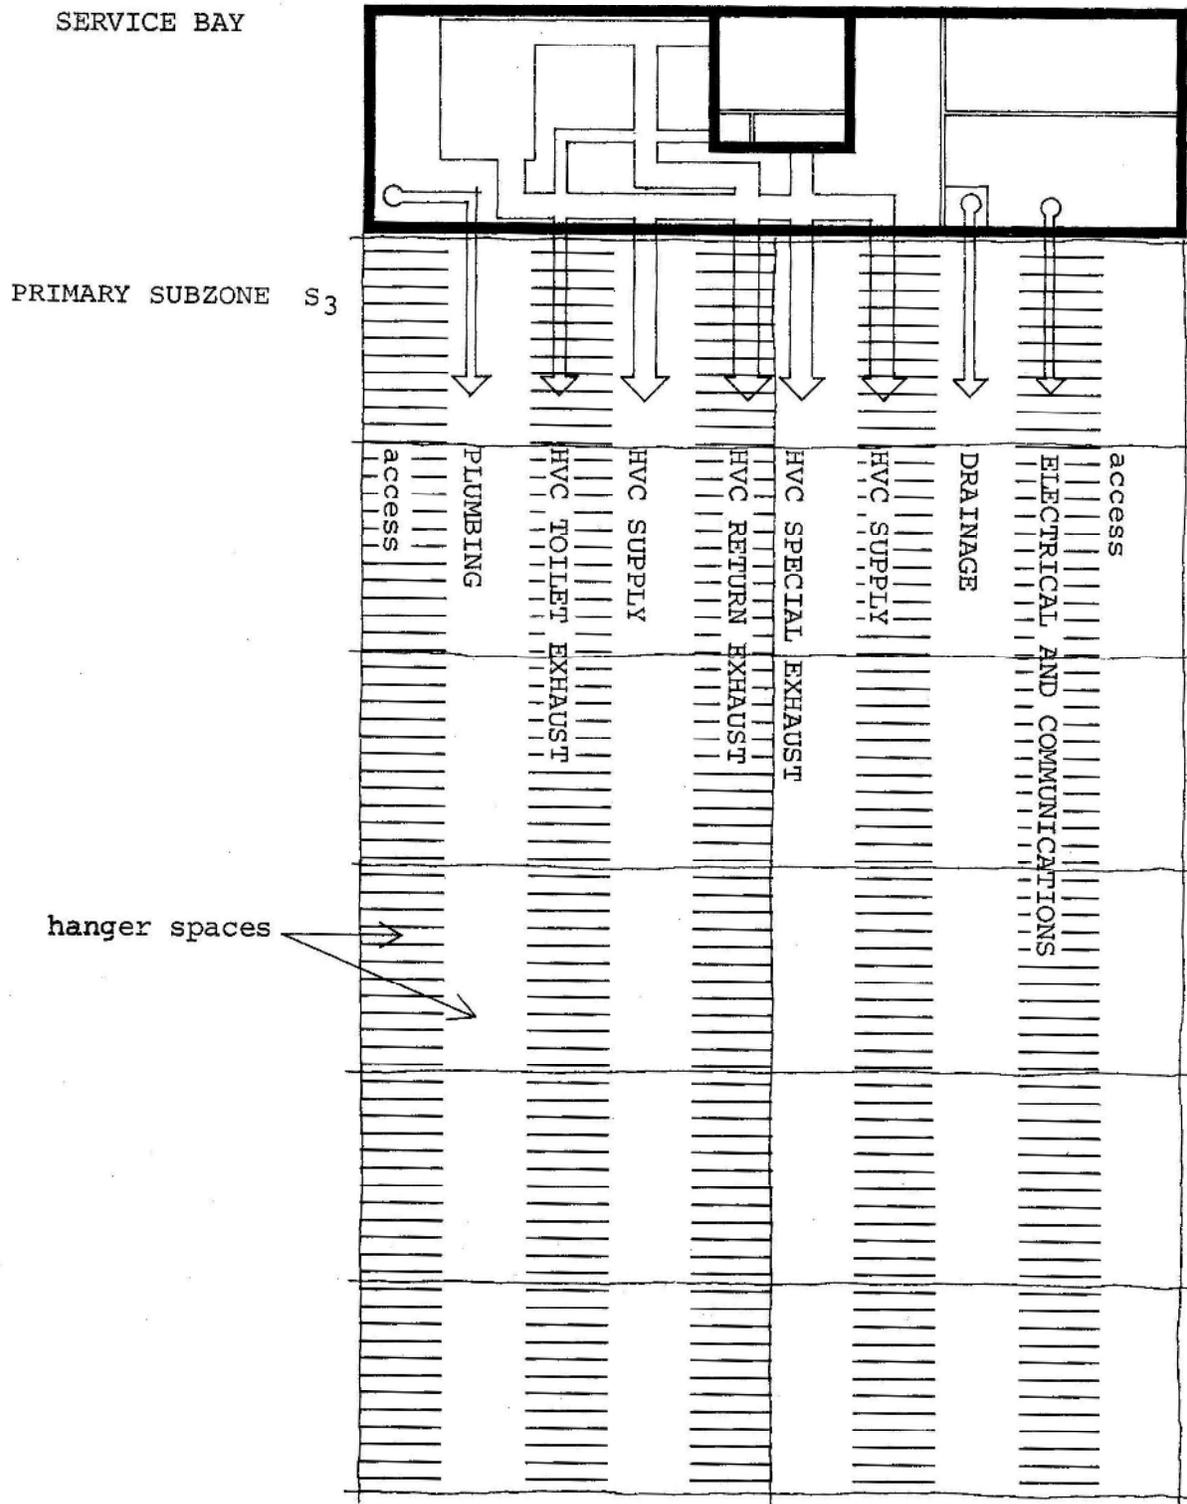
CHANNELS: SECTION PARALLEL TO BEAMS
